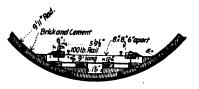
St. Clair Tunnel; Grand Trunk Ry.
